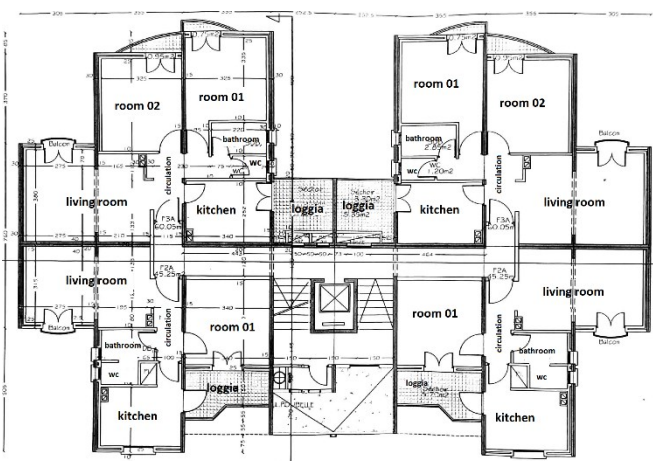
Floor plan F3 and F2—linear block (Source: OPGI, 2023)
